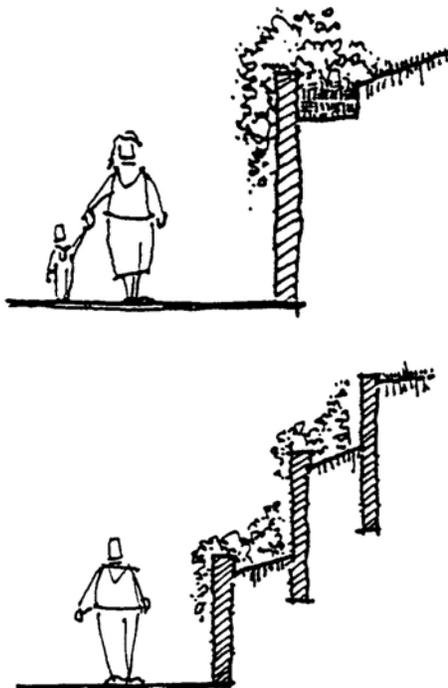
Use landscaping to screen retaining walls near the sidewalk.
